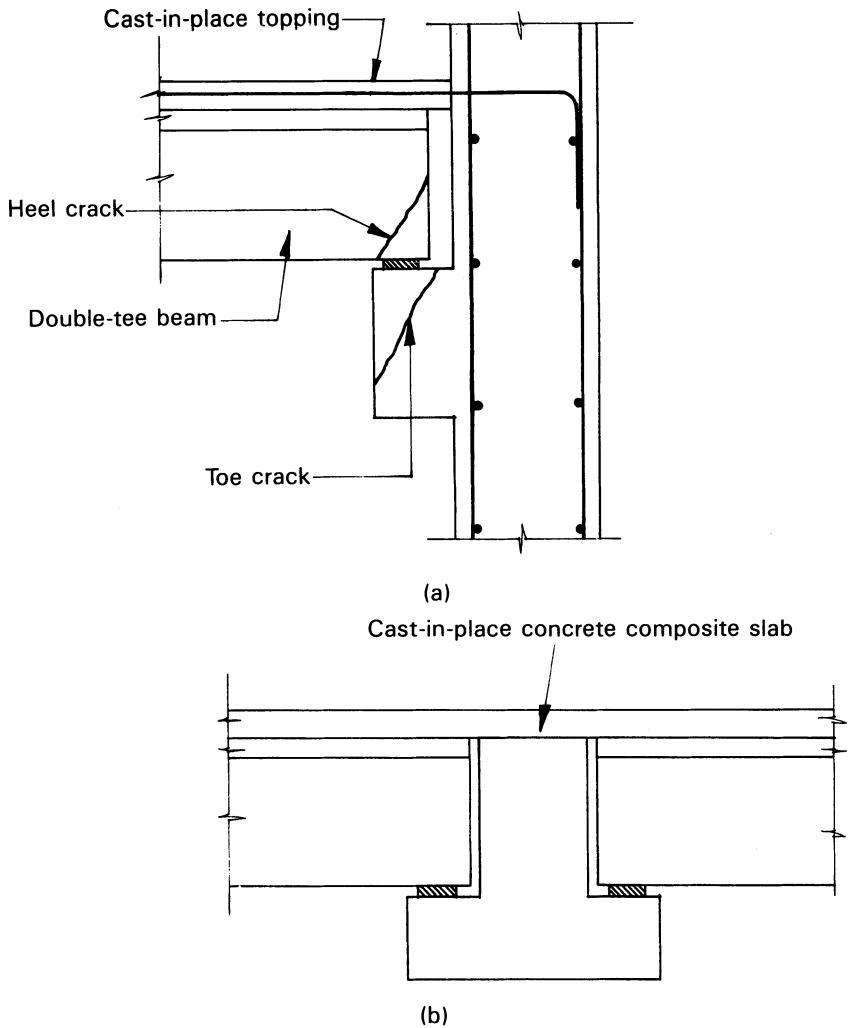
A typical concrete ledger and a typical concrete ledge. (a) Cast-in-place concrete ledger supporting a double-tee beam. (b) Ledges of inverted-tee beam supporting double-tee beams.
